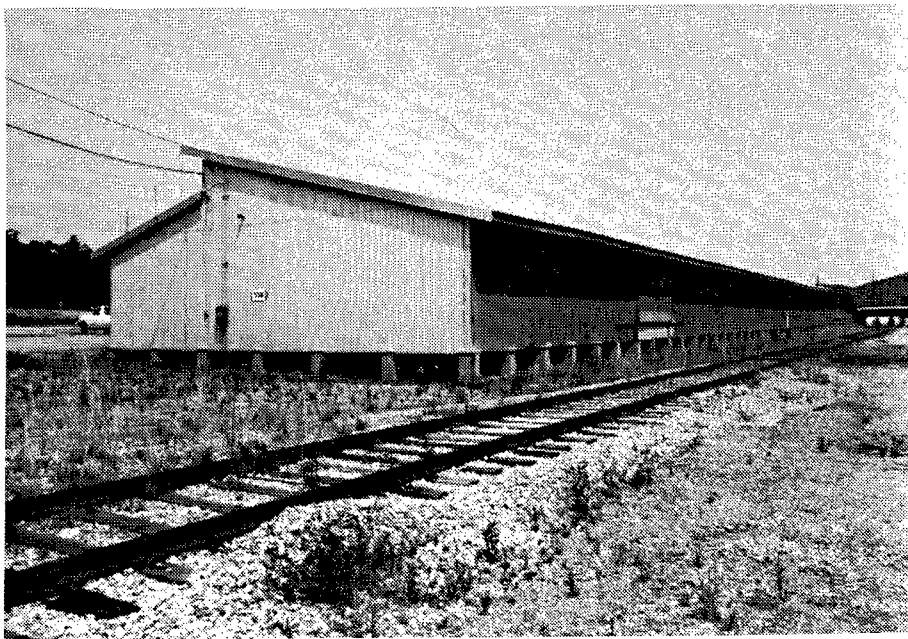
Building 558: Storage Warehouse, Heavy Equipment Parts and Shop.
